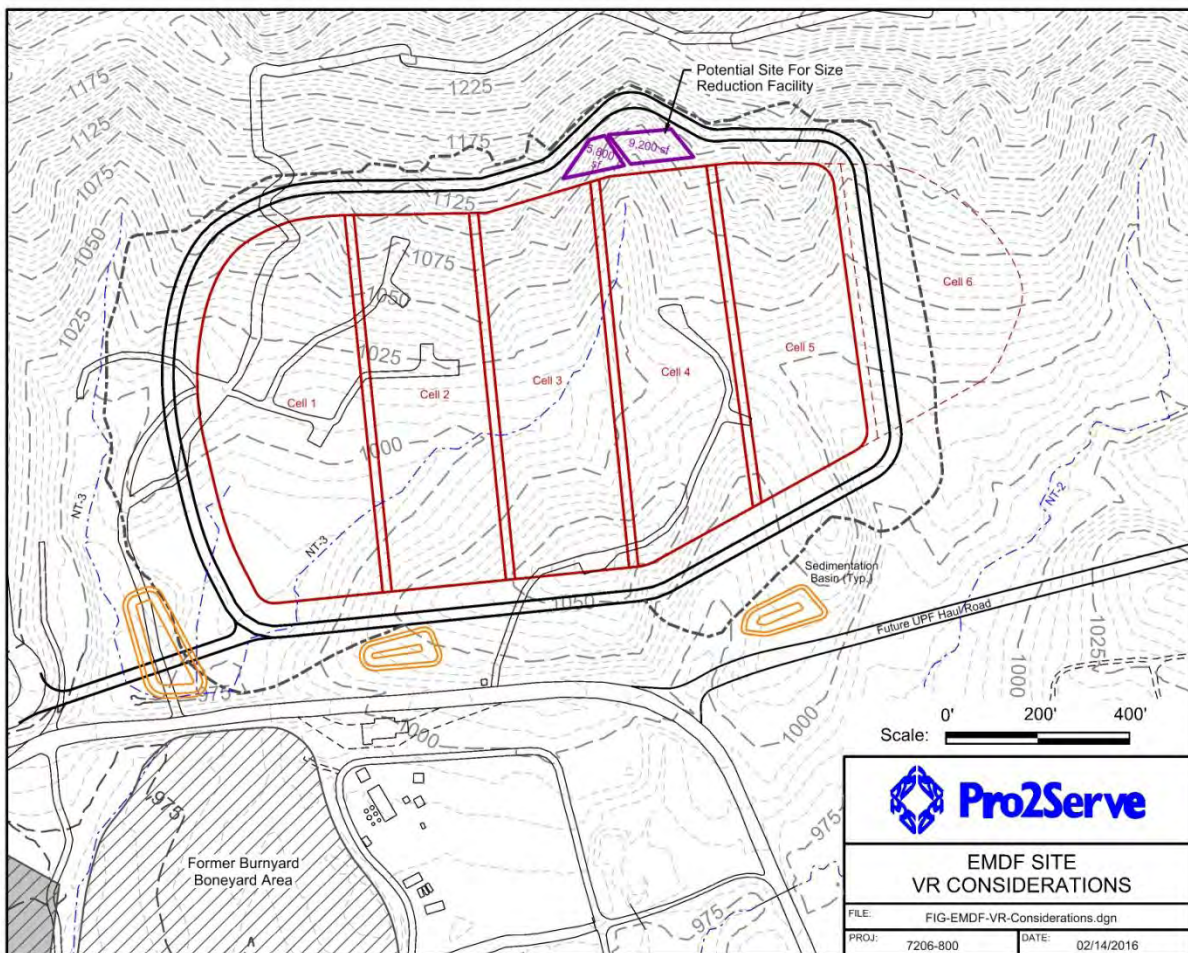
EMDF EBCV Site Plan with Potential Location for Size Reduction Facility
